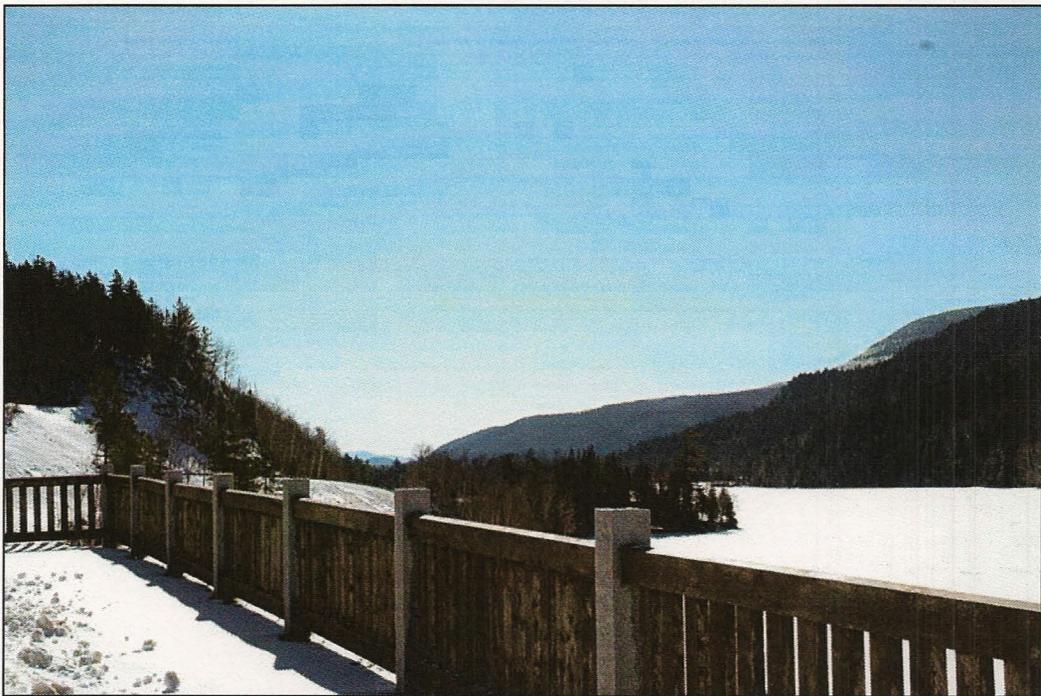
Scenic overlook and recently installed railing along Route 27 looking southeast towards Natanis Pond (March 2010)
